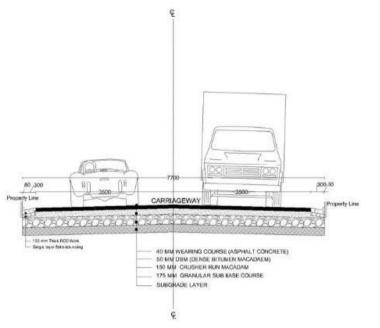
Typical Cross section for 7.7 m road (section Type A)
